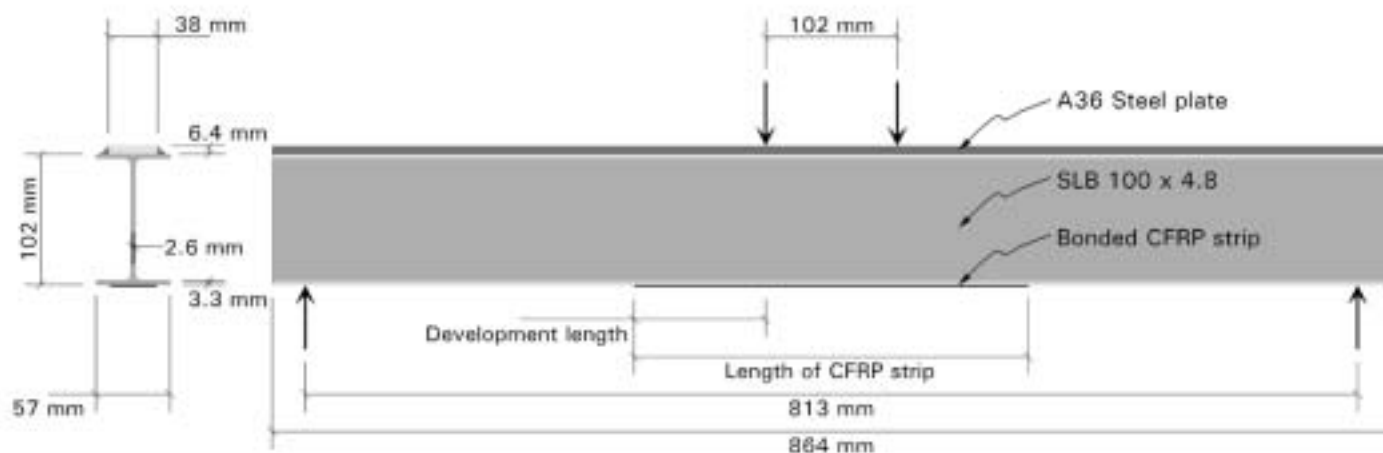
Cross-section dimensions and loading configuration of typical adhesive selection and development length specimen.
